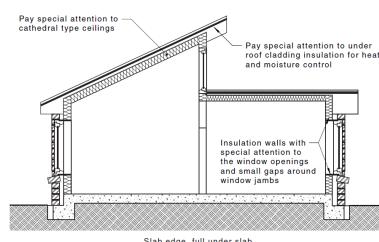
EXAMPLE OF THERMAL ENVELOPE WITH SLAB ON GROUND
